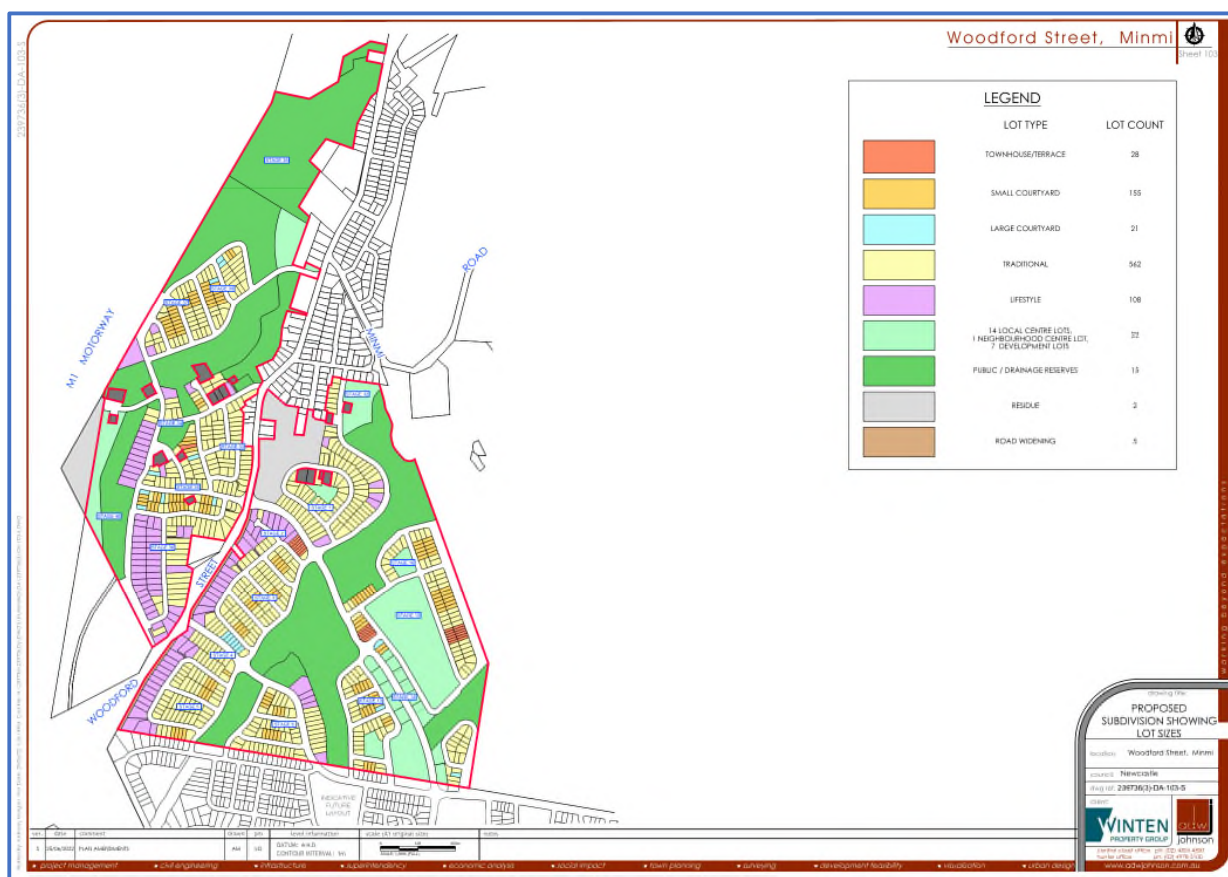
Lot Typology and Allocations (Source – Subdivision Plans, Sht 3)
